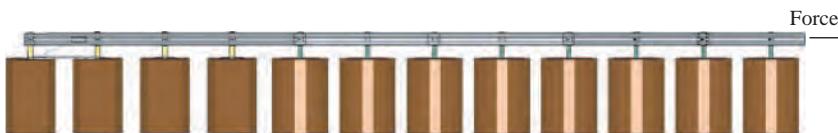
Simulation setup for G41S section subjected to a longitudinal load.
